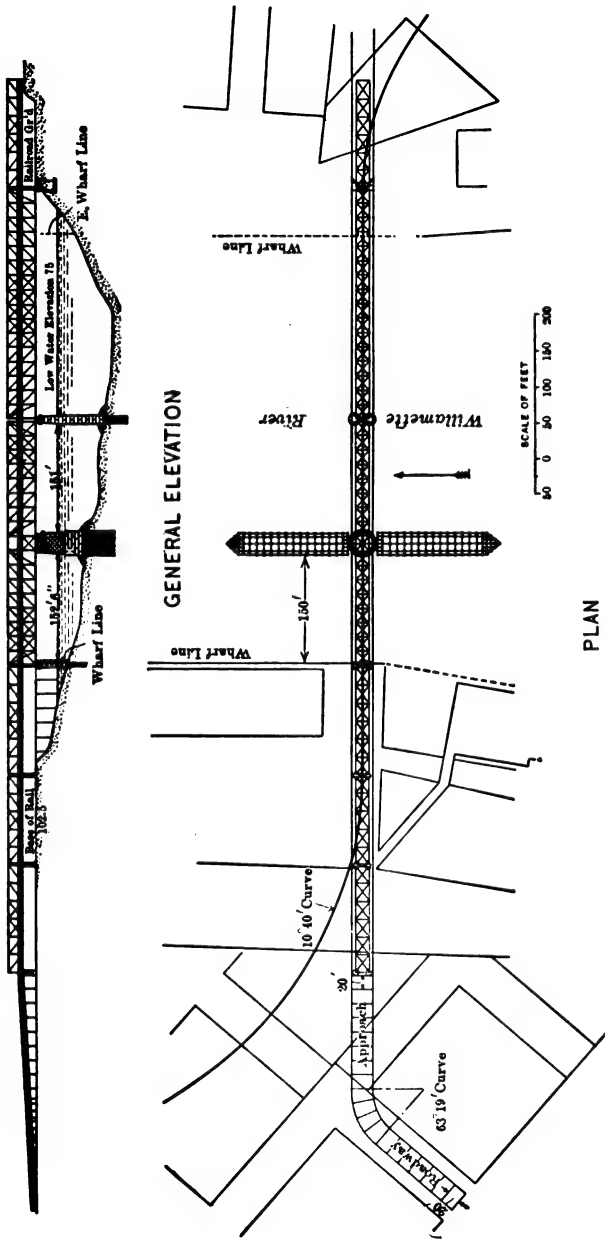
PROFILE OF STEEL BRIDGE PIERS, PORTLAND.
